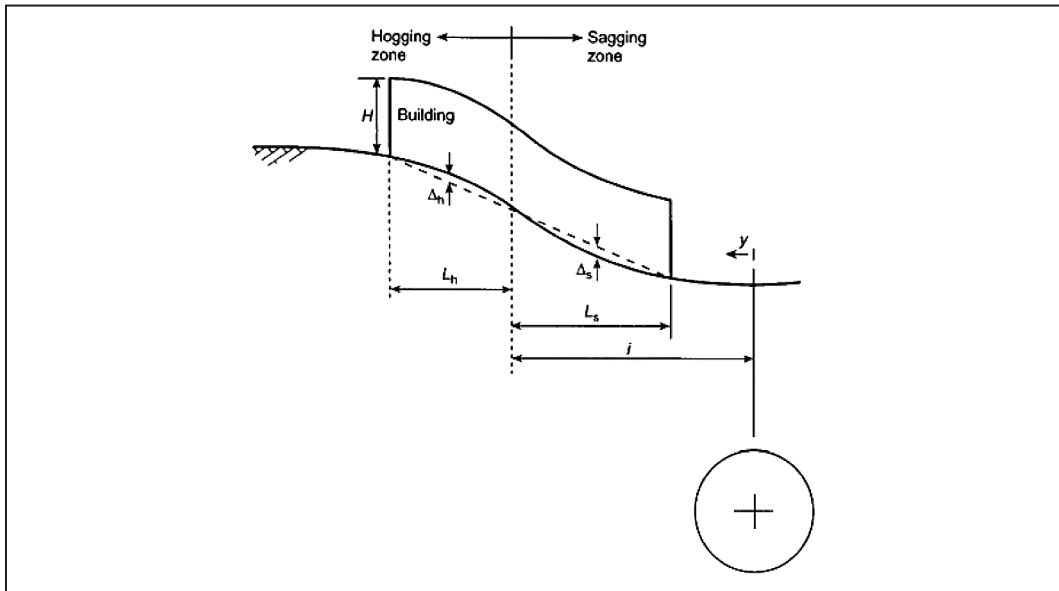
Building deflection in hogging and sagging zones (Mair et al., 1996)
